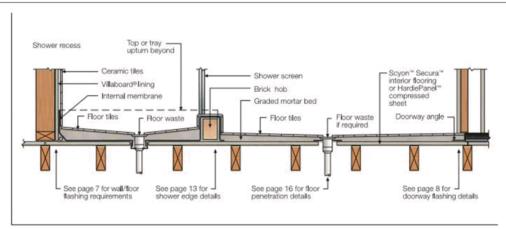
TYPICAL BATHROOM CROSS-SECTION
